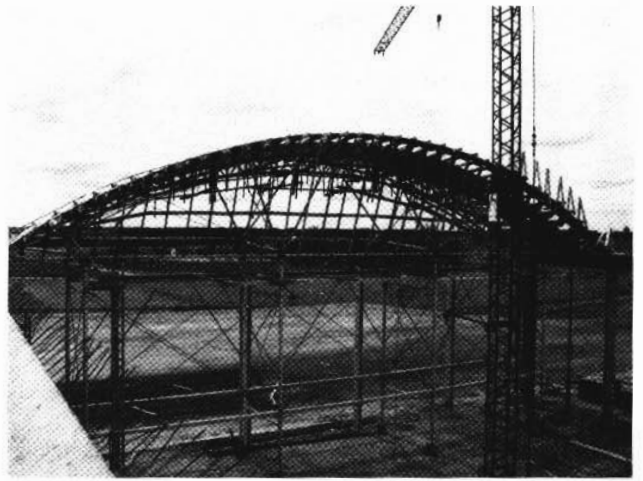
Metal framework and timber superstructure (ribs and planking) of formwork for a vault of 98.5-foot (30-meter) span. Rails are placed just under the outermost steel pipe columns. During horizontal displacement of the form, the central columns do not play a structural role. (Lanas Trinidad wool warehouse, Durazno, ca. 1988)
